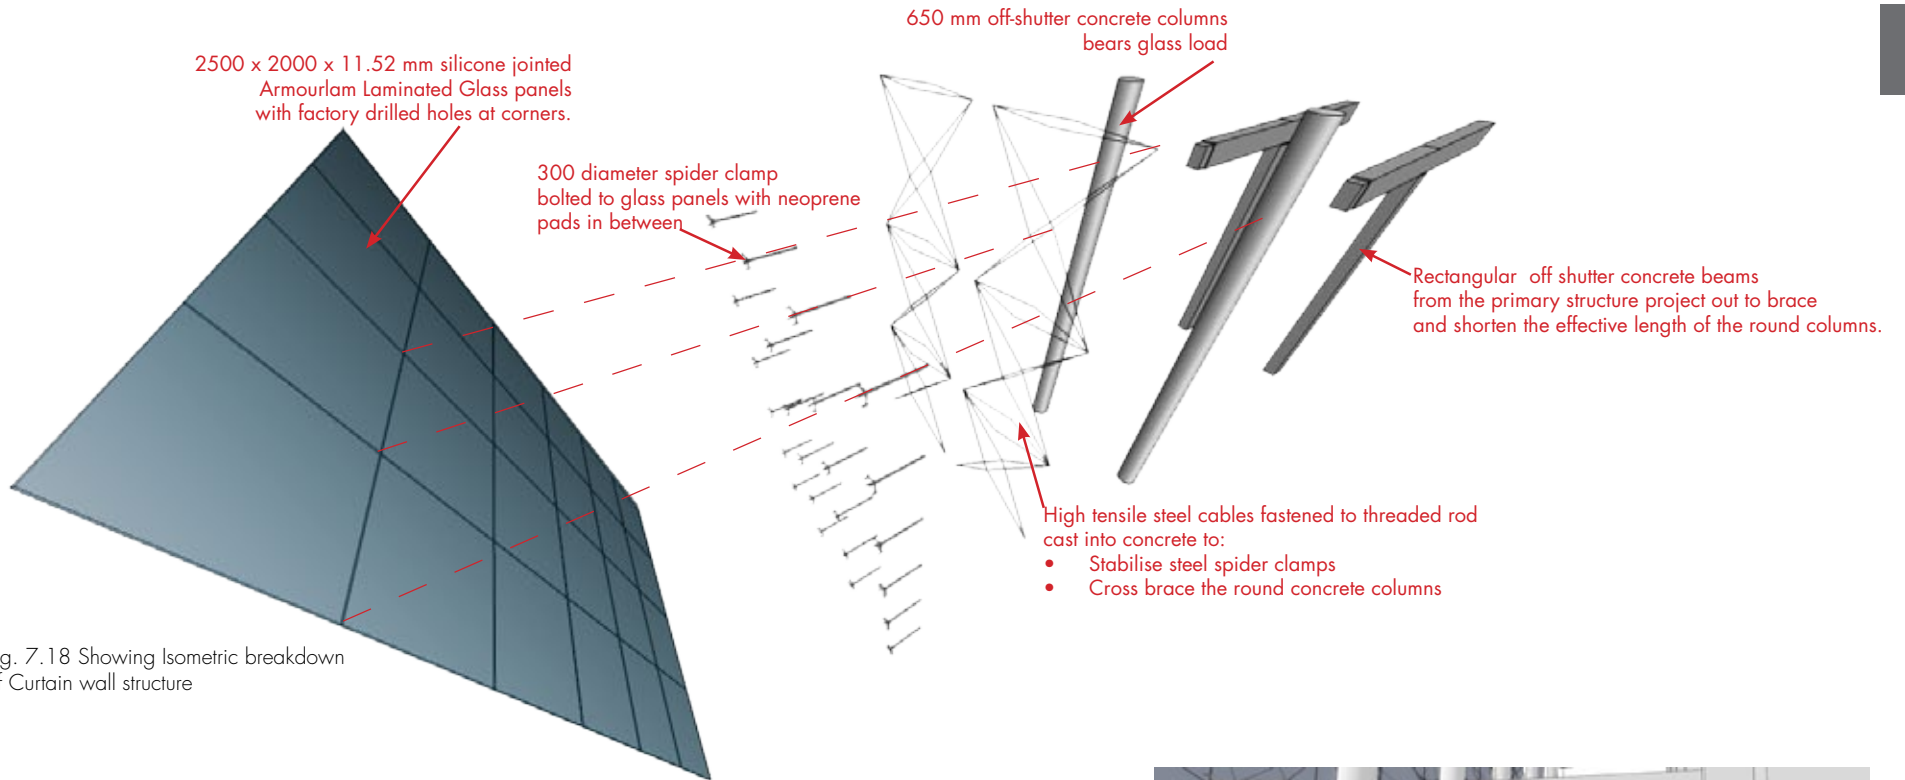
Showing Isometric breakdown of Curtain wall structure
